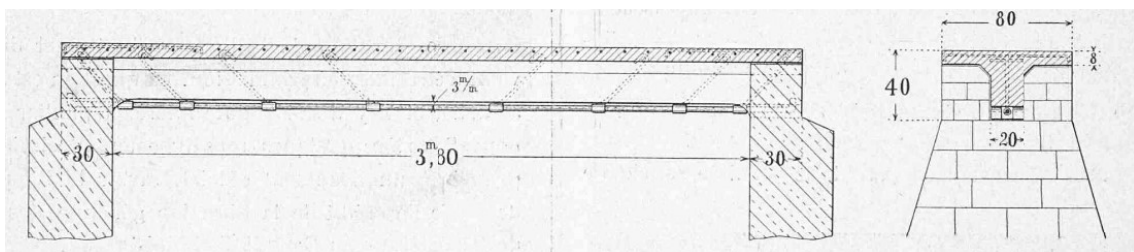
Reinforced concrete beam of the Lossier system (Vautier, 1903).
